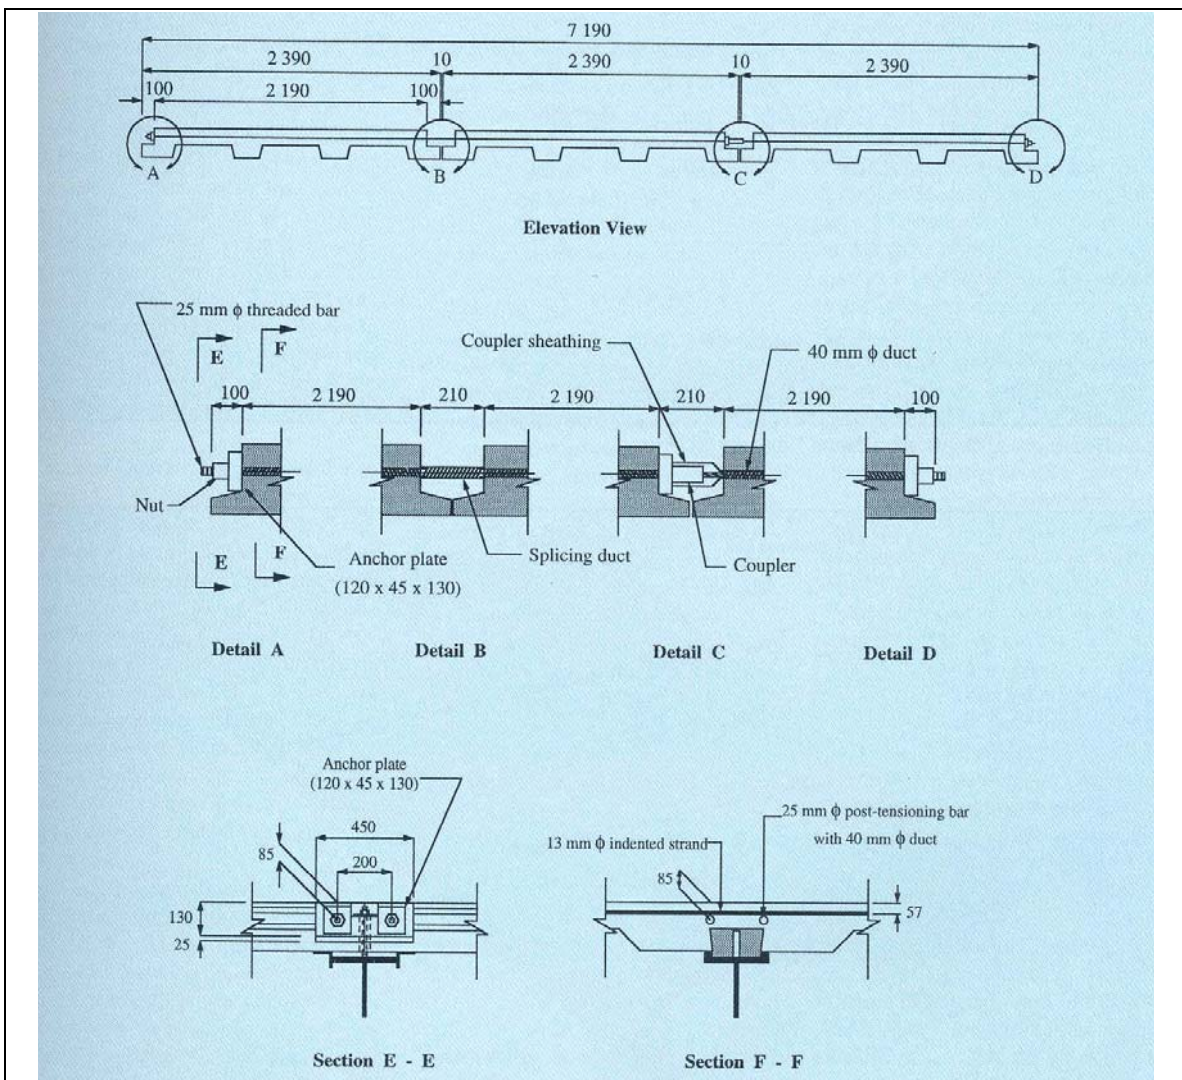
Typical details for longitudinal post-tensioning (Yamane et al., 1998)
